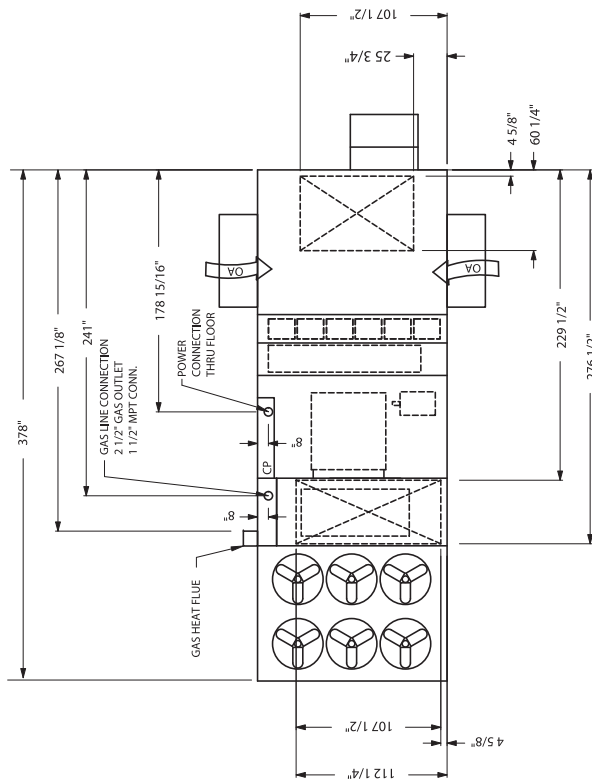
GENERAL ARRANGEMENT DRAWING
